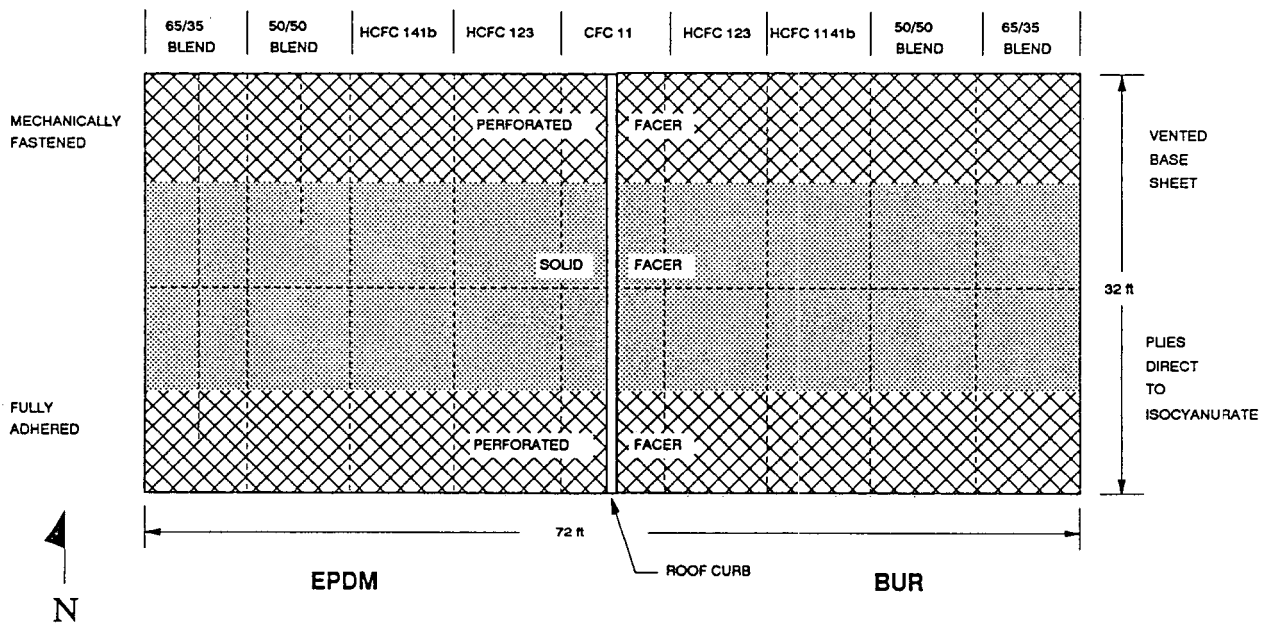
Roof Mechanical Properties Research Apparatus - roof platform layout.
